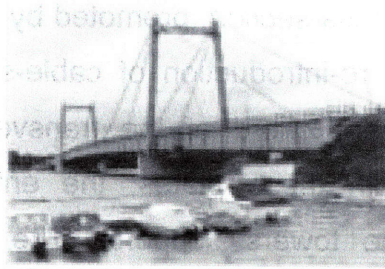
Stromsund Bridge, the first modern cable-stayed bridge, completed in 1955⁸
